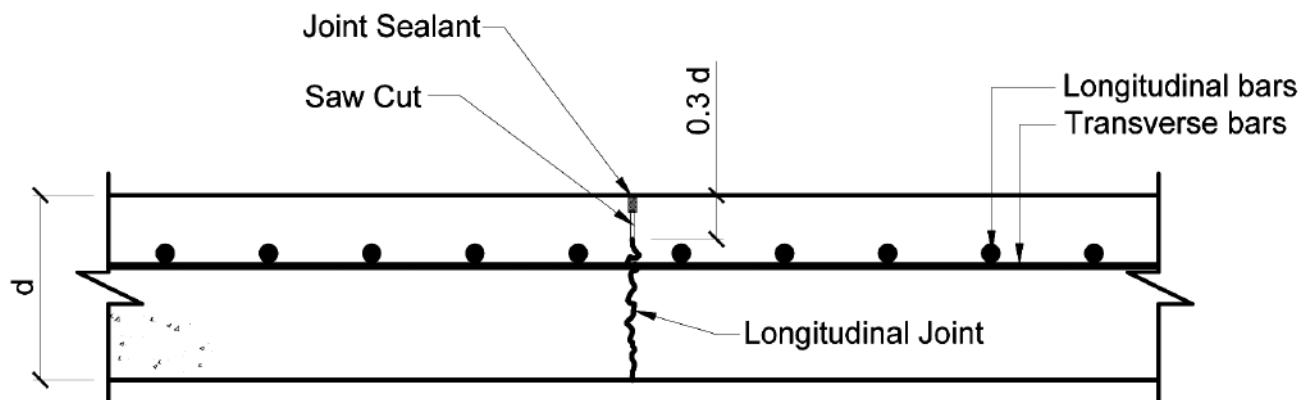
Longitudinal Construction (Hinged) Joint with Transverse Bars
